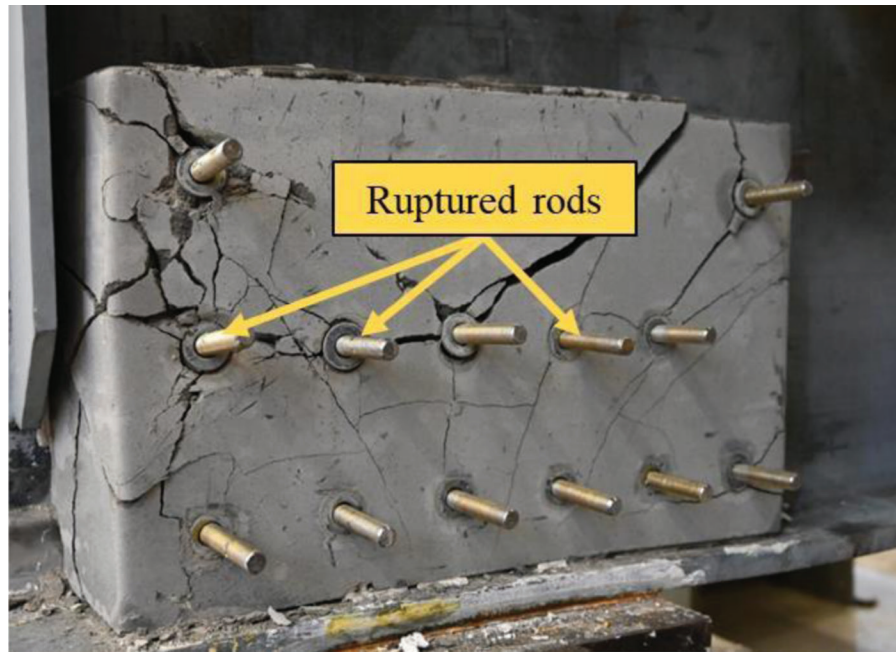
Specimen 4: cracking in west panel (elevation view).
